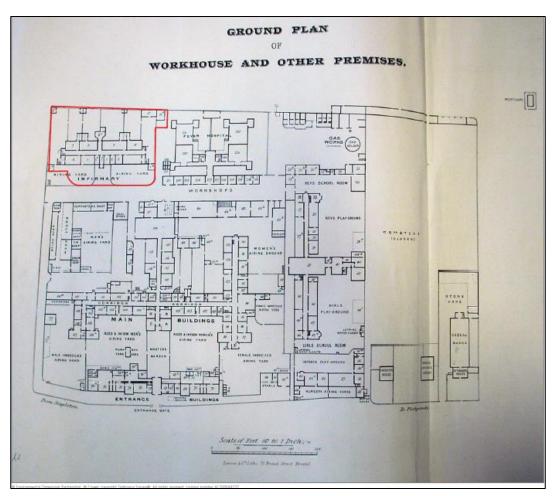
Ground floor plans of the Building from 1898 (courtesy of EDP)
